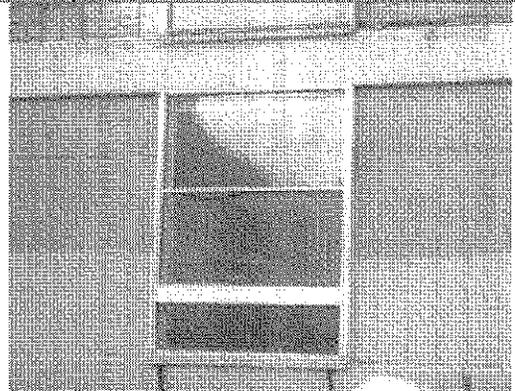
Example of aluminum-framed window with Plexiglass glazing
